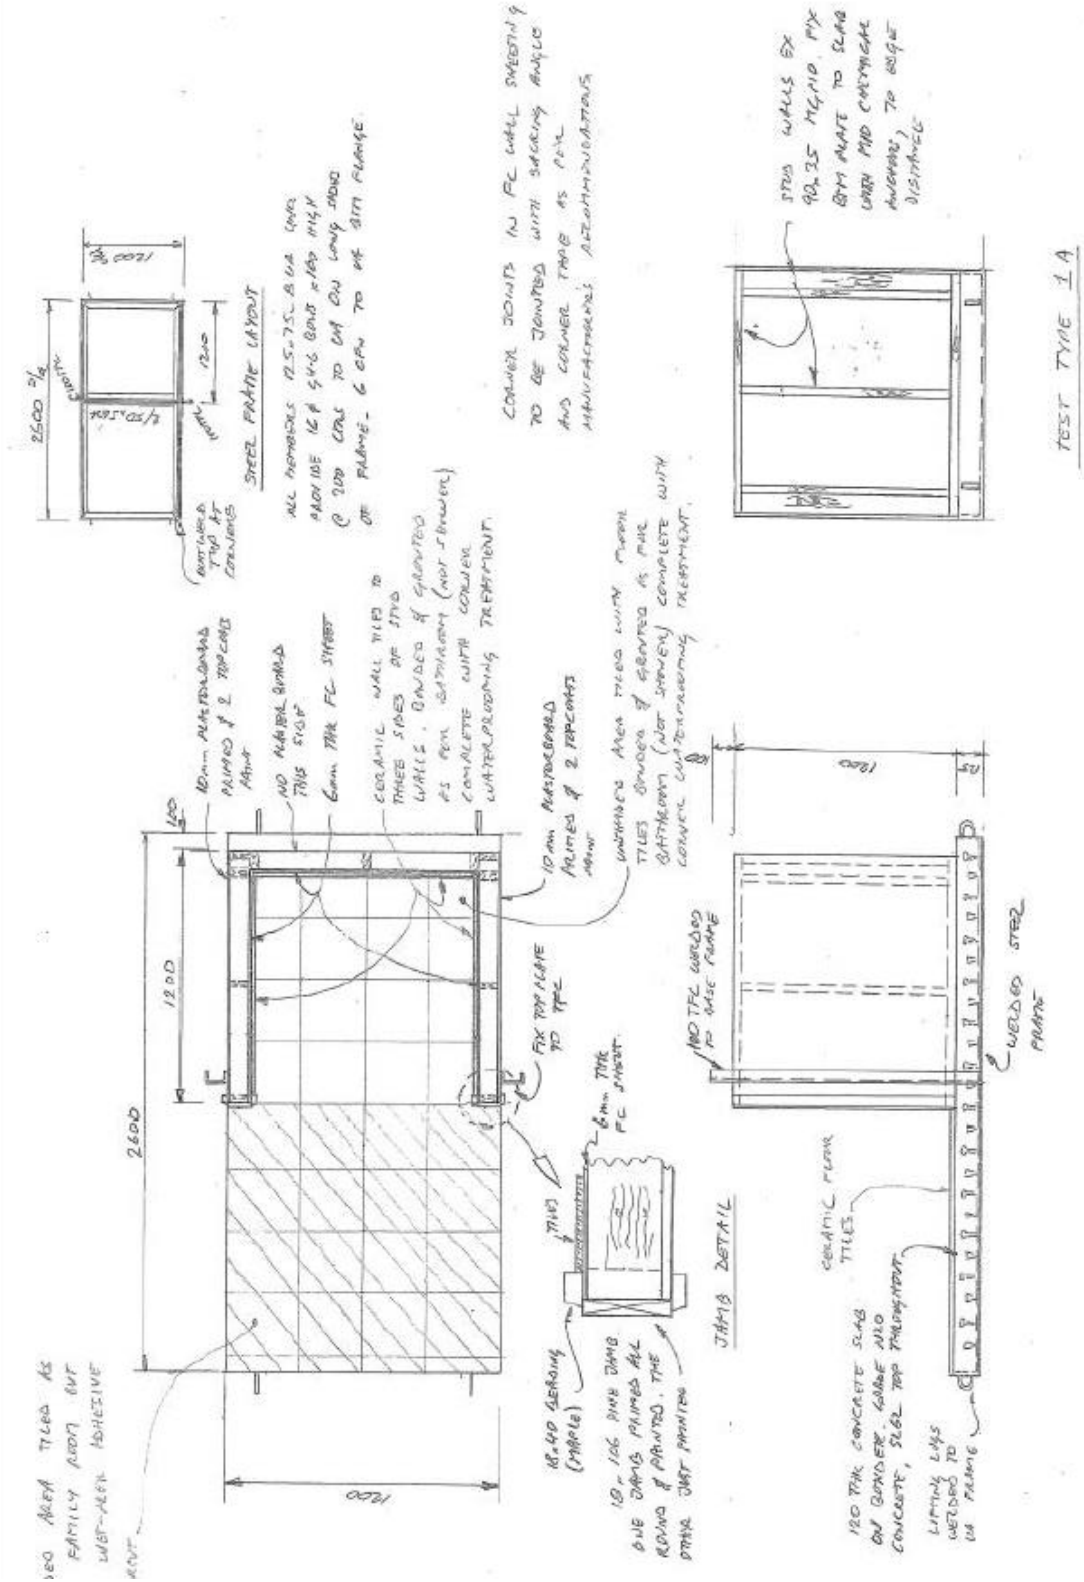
CONSTRUCTION DETAILS OF THE BATHROOM SAMPLES
